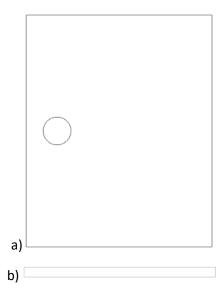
Dowel plate: a) top plan view; b) front and side view
